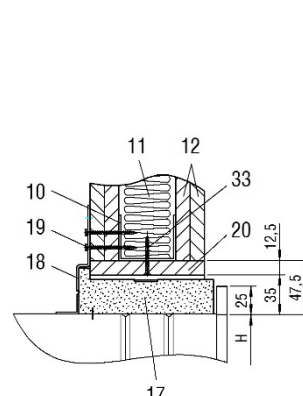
BKP-EN with installation frame type ER-P1 and shown fixing lugs
